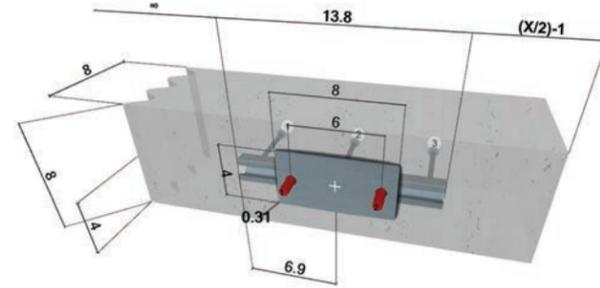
Example of use of HAC-40 91/300 F on a curb installing the anchor channel Face of curb.
